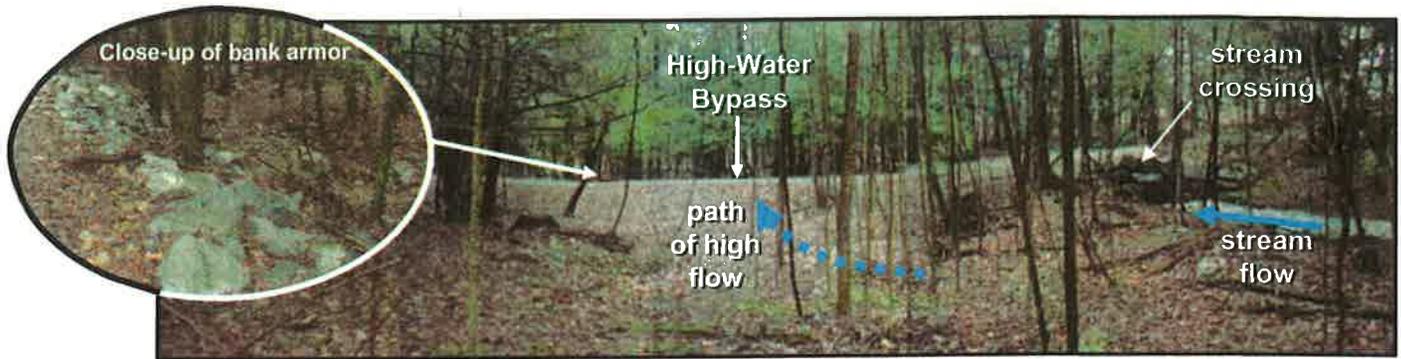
Geo-synthetic and rock reinforcement was used on the bypass due to width limitations and a steep drop-off on the downslope side of the road. When stream flow exceeds pipe capacity at the crossing, water will flow over the bypass.
